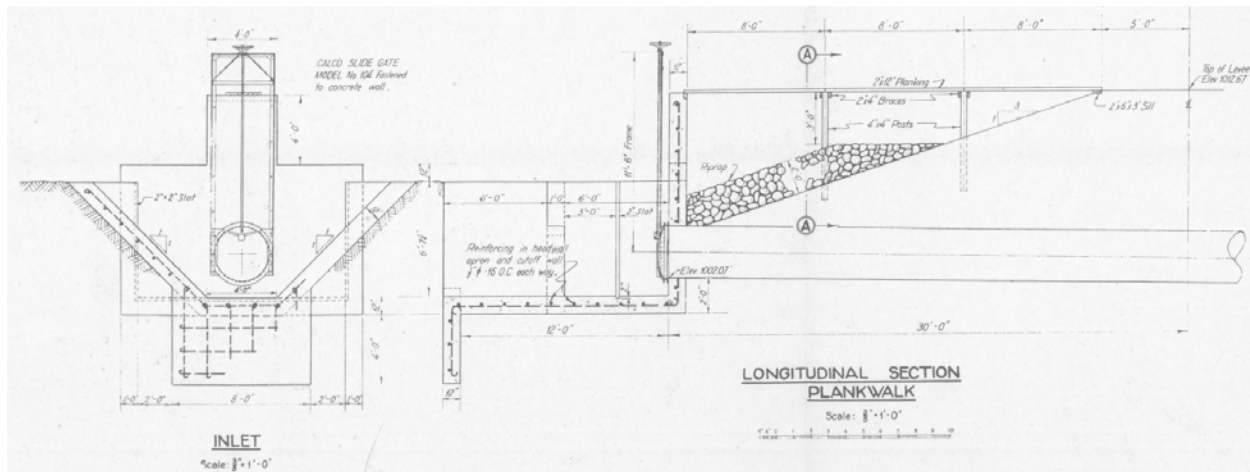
Existing Blue Slough Headworks and Culvert – Plan and Longitudinal Section
